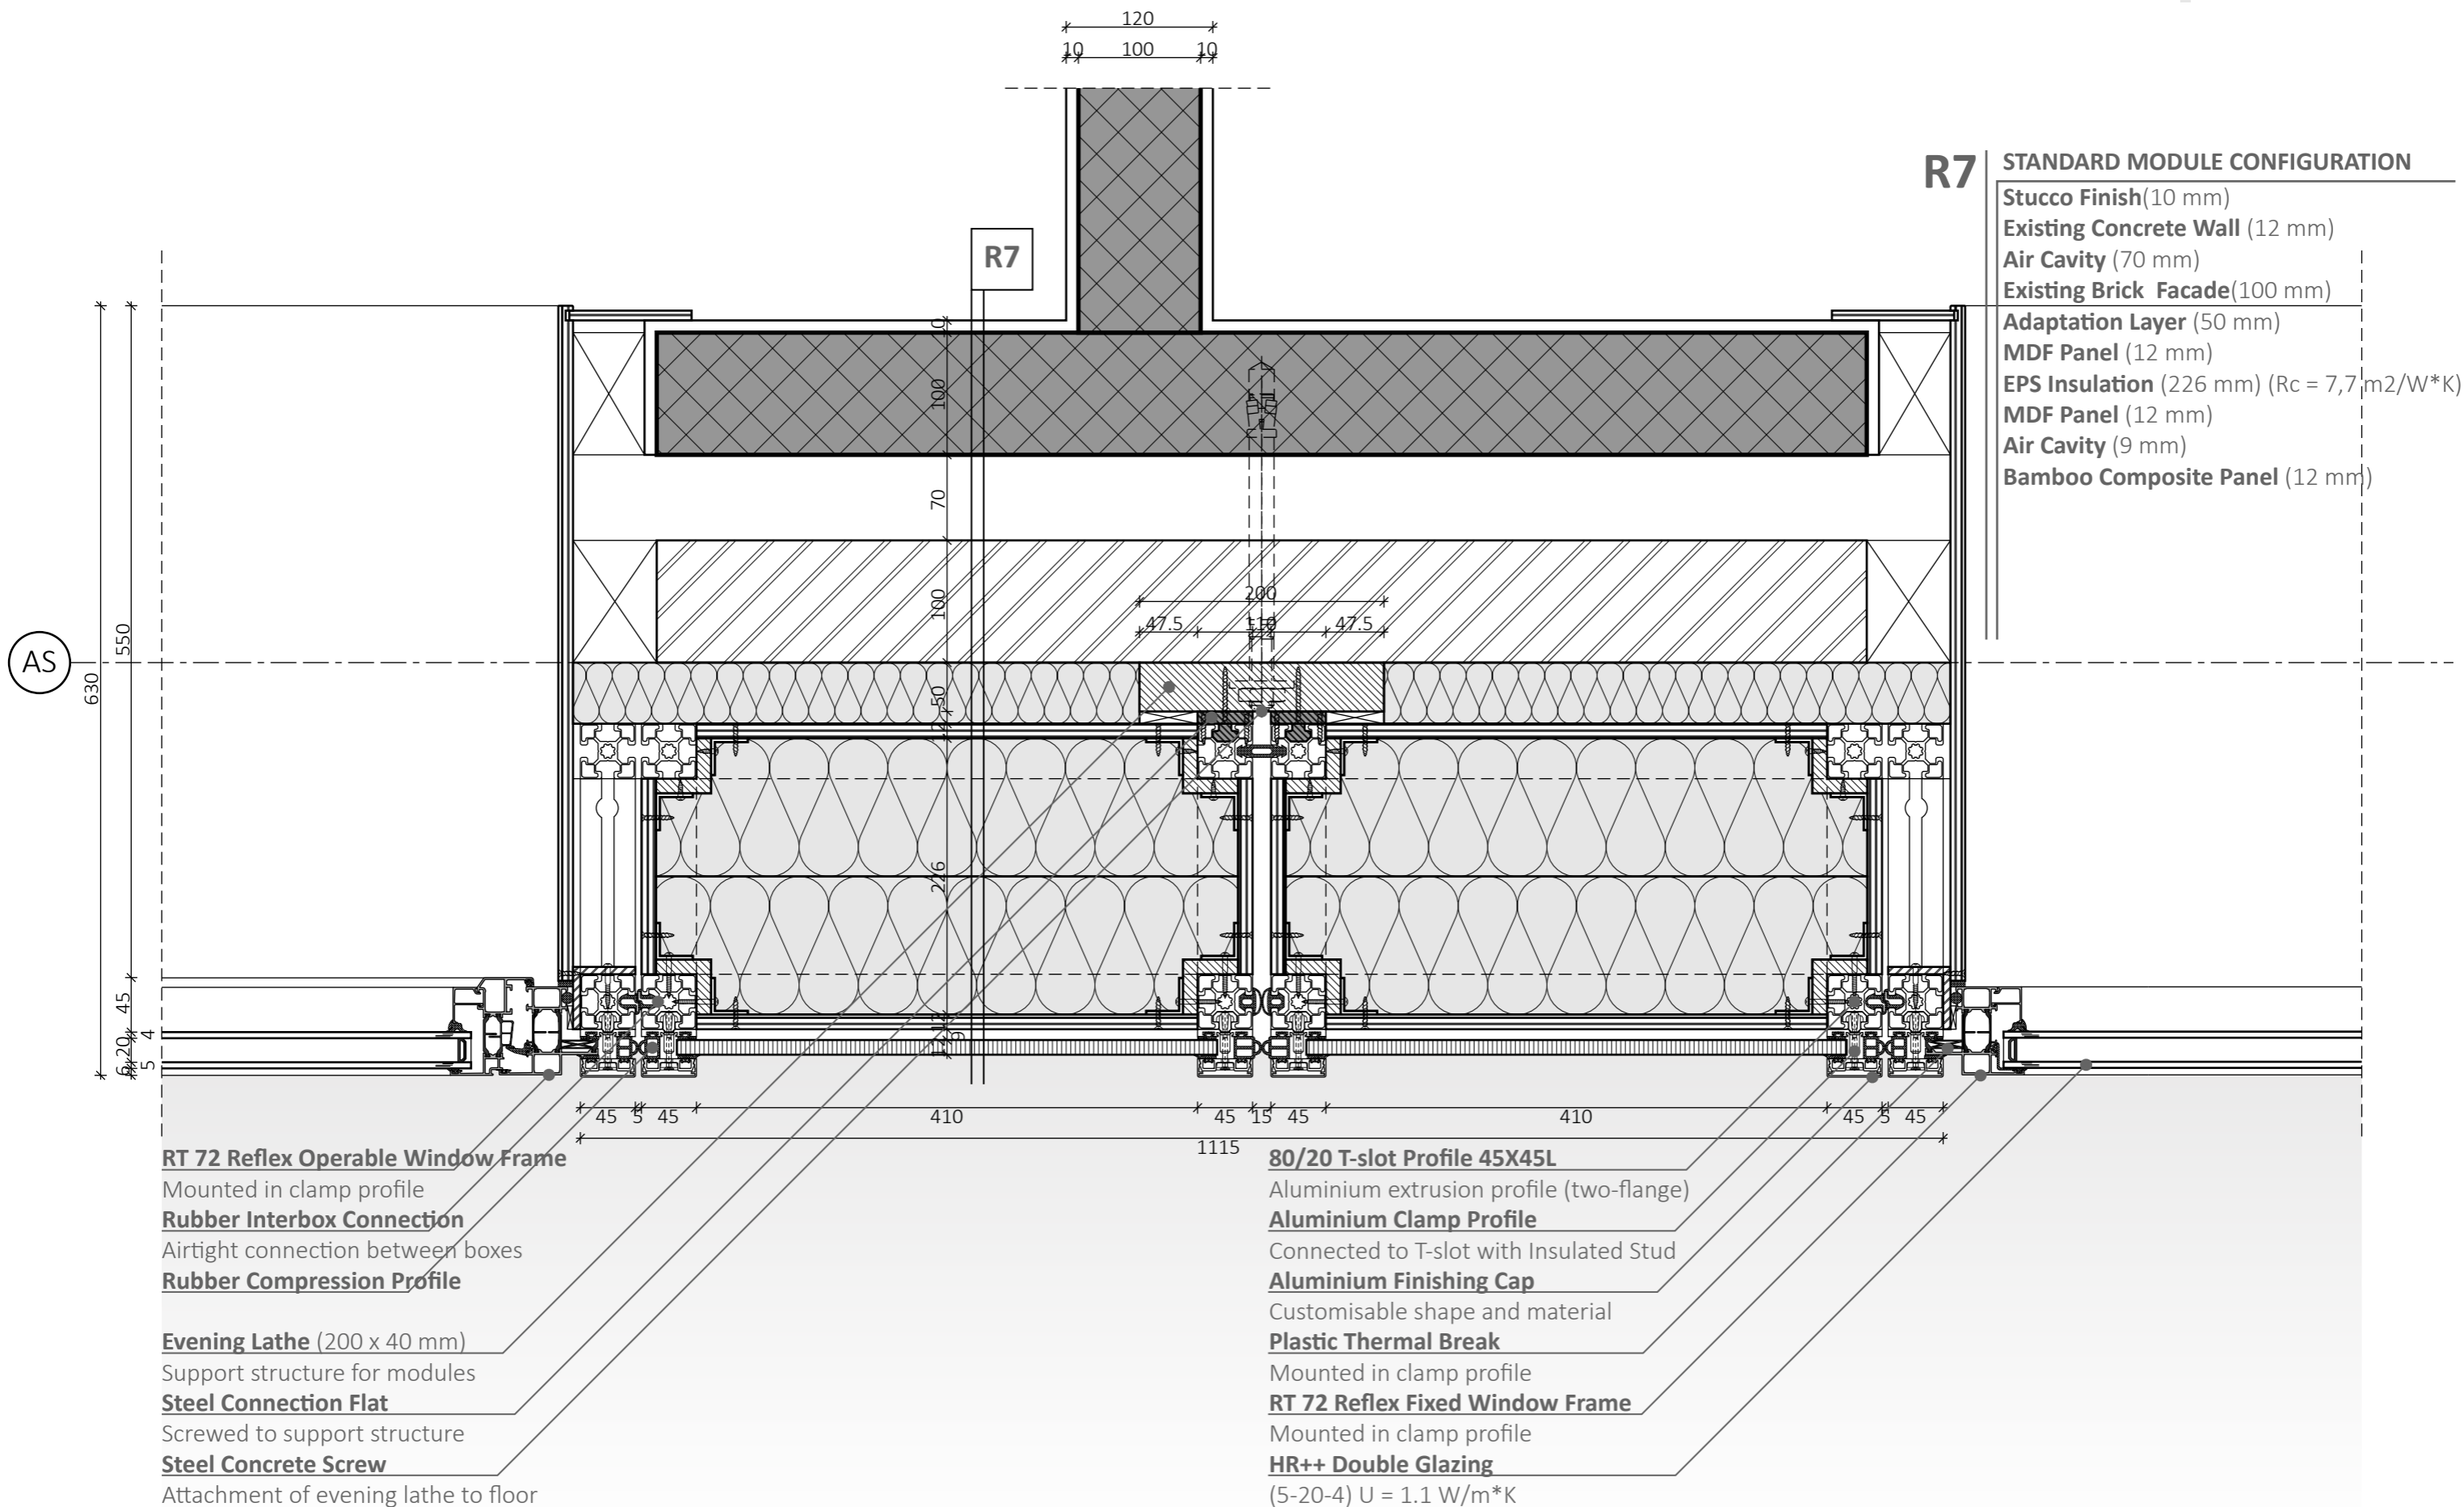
Detail | 1:5 | Horizontal | Module Connection
